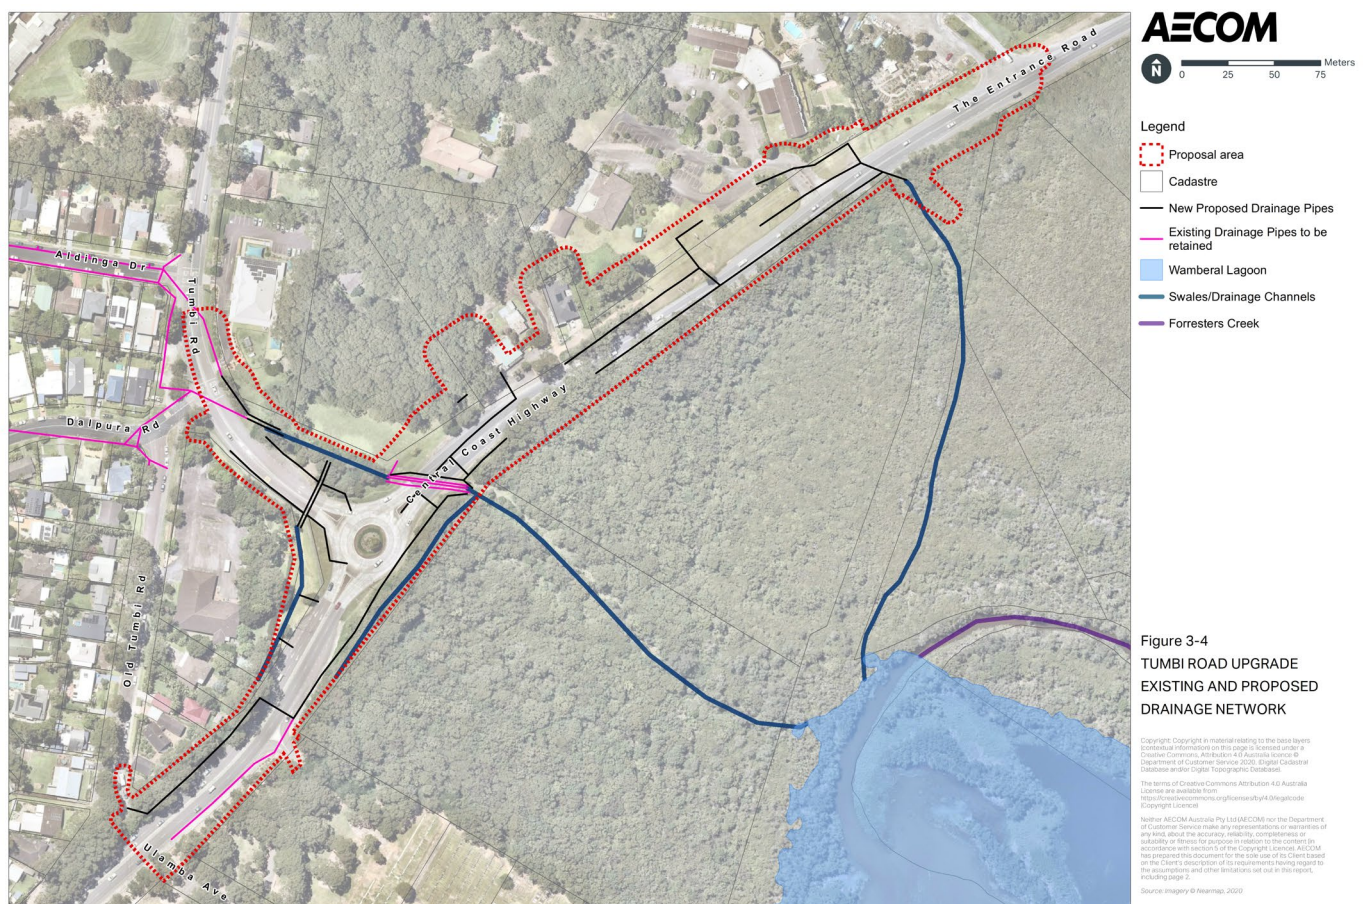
Tumbi Road Upgrade – Existing and Proposed Drainage Network
